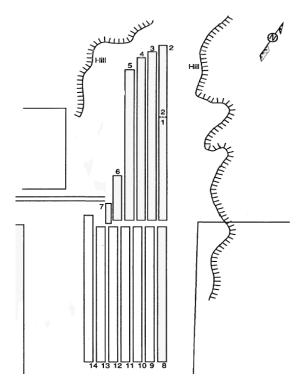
West Valley, NY SDA Disposal Trenches Configuration
